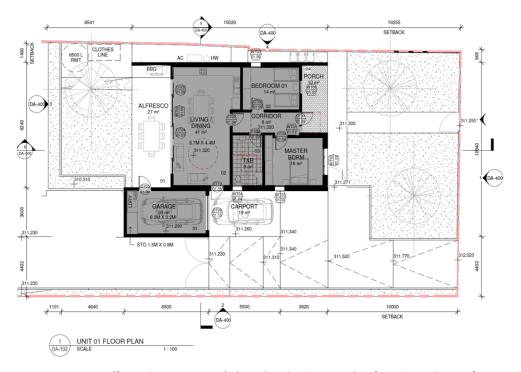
Unit 01 (facing Cummins Street) Floor Plan showing a modest footprint and green front yard that will positively contribute to the streetscape. The front setback is a generous 10m to the master bedroom, and 12m to the entry/ bedroom 01. The garage has a separate roof from the main building and is set as far back as possible.
